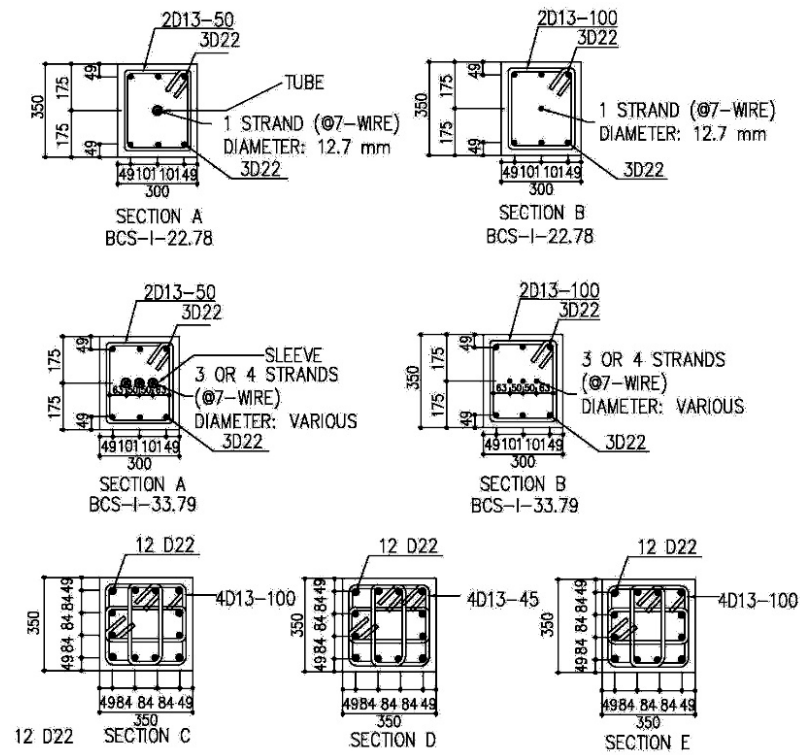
SI-A-33.79, SI-B-33.79, and SI-B-22.78 test specimens [1].
